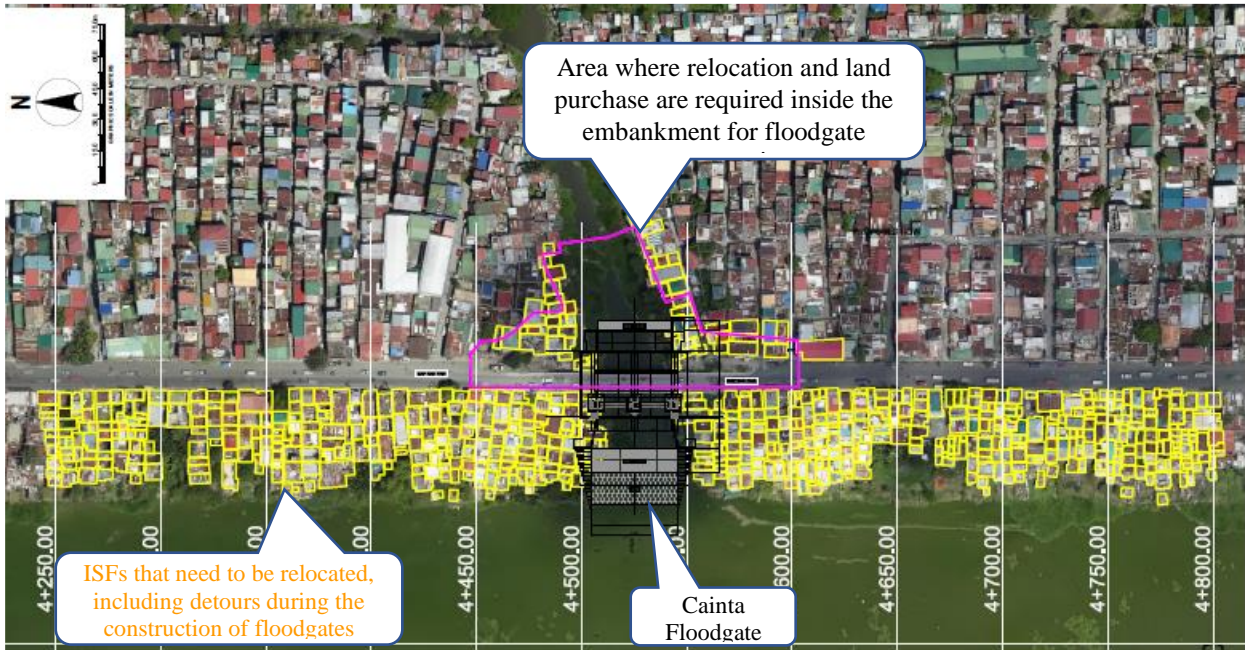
General Plan View of Cainta Floodgate Construction
